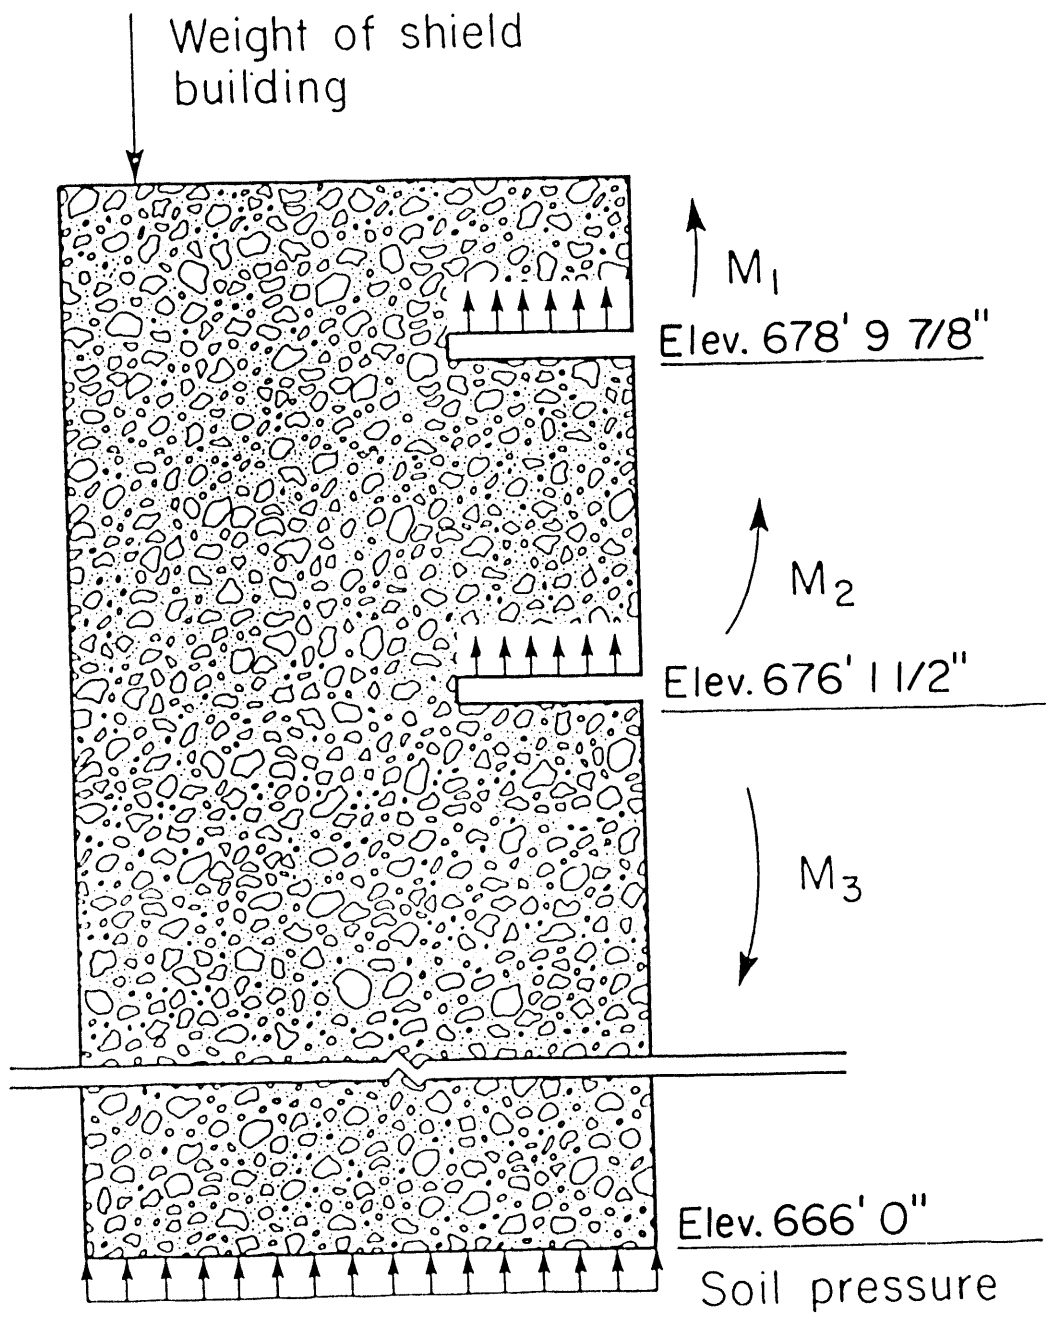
Loads Acting on Containment Basemat in the Vicinity of the Anchorage System (Anchor Bolt not Shown)
